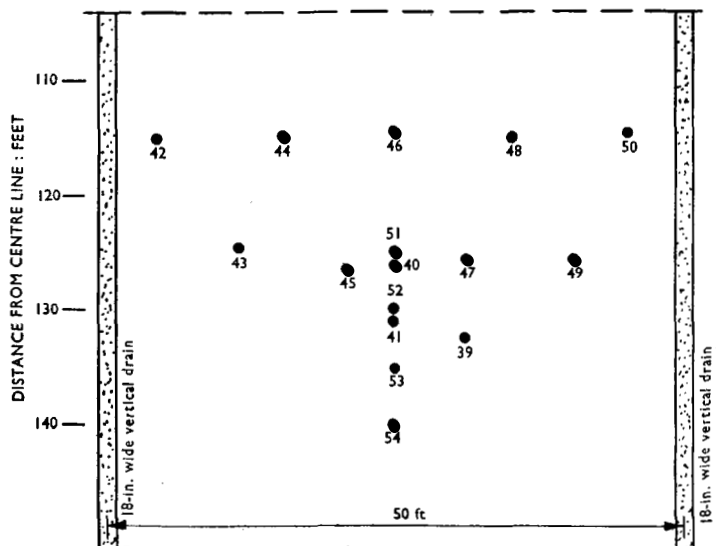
PLAN OF PIEZOMETER GROUP 39-54
